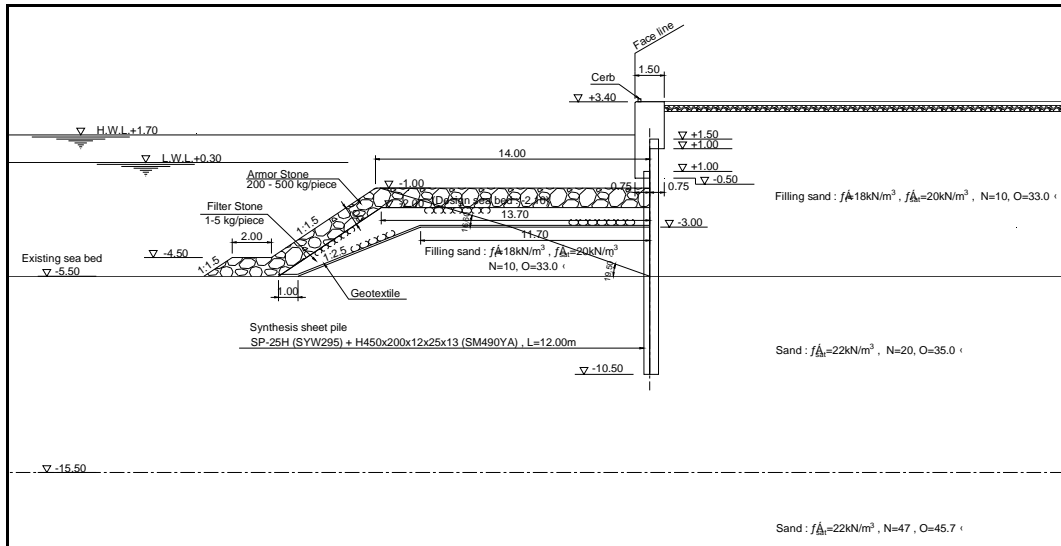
Typical Section of Transitional Part with Existing West Quay (Steel Sheet Pile Section)
